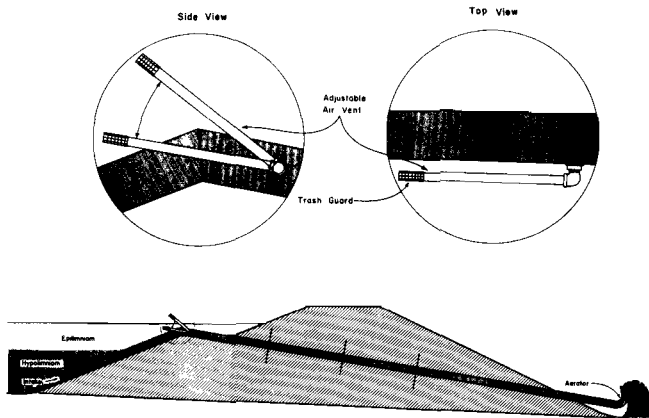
Cross section of dam with bottom withdrawal spillway.
